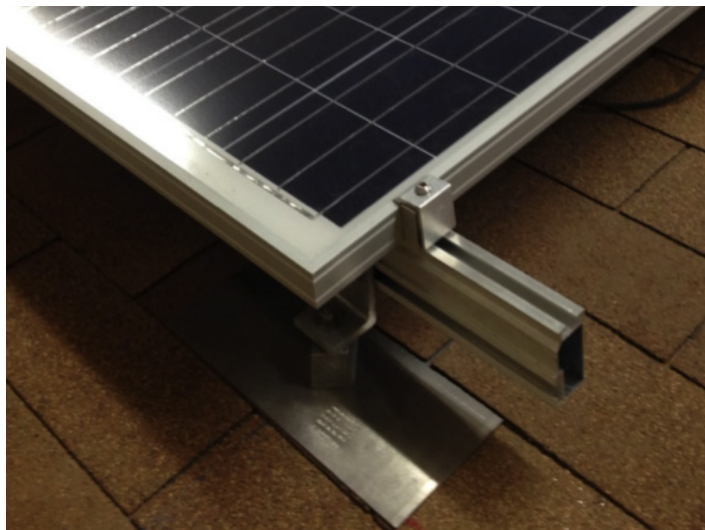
A roof-mount system for an asphalt shingle roof includes aluminum flashing and mounting materials such as L-feet, rails, and clamps to secure the modules in place.
